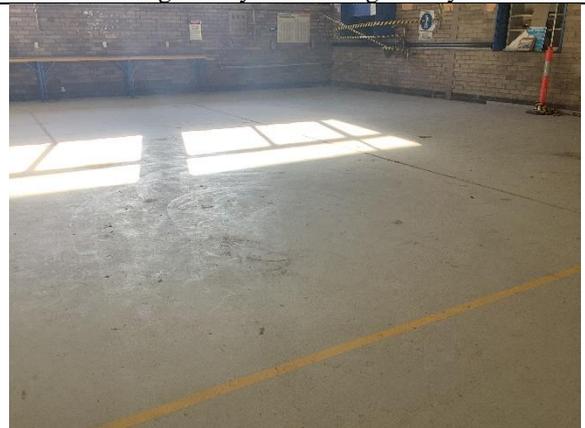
Building A – A.G.16 - Throughout – Floor – Paint – Light Grey
